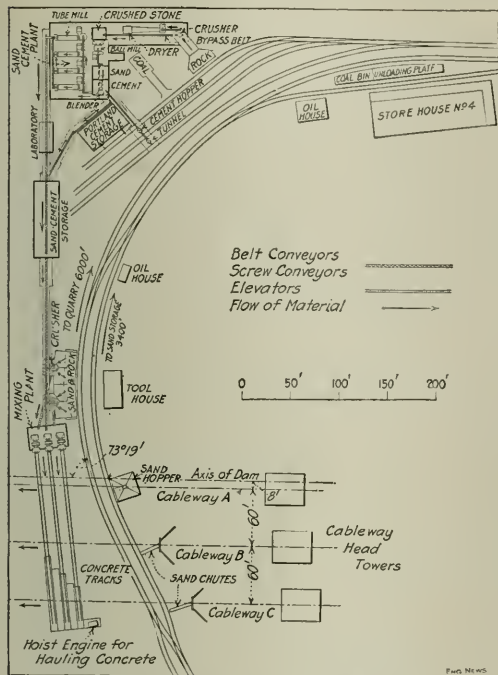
PLAN OF ELEPHANT BUTTE MIXING, SAND-CEMENT AND STORAGE PLANTS
